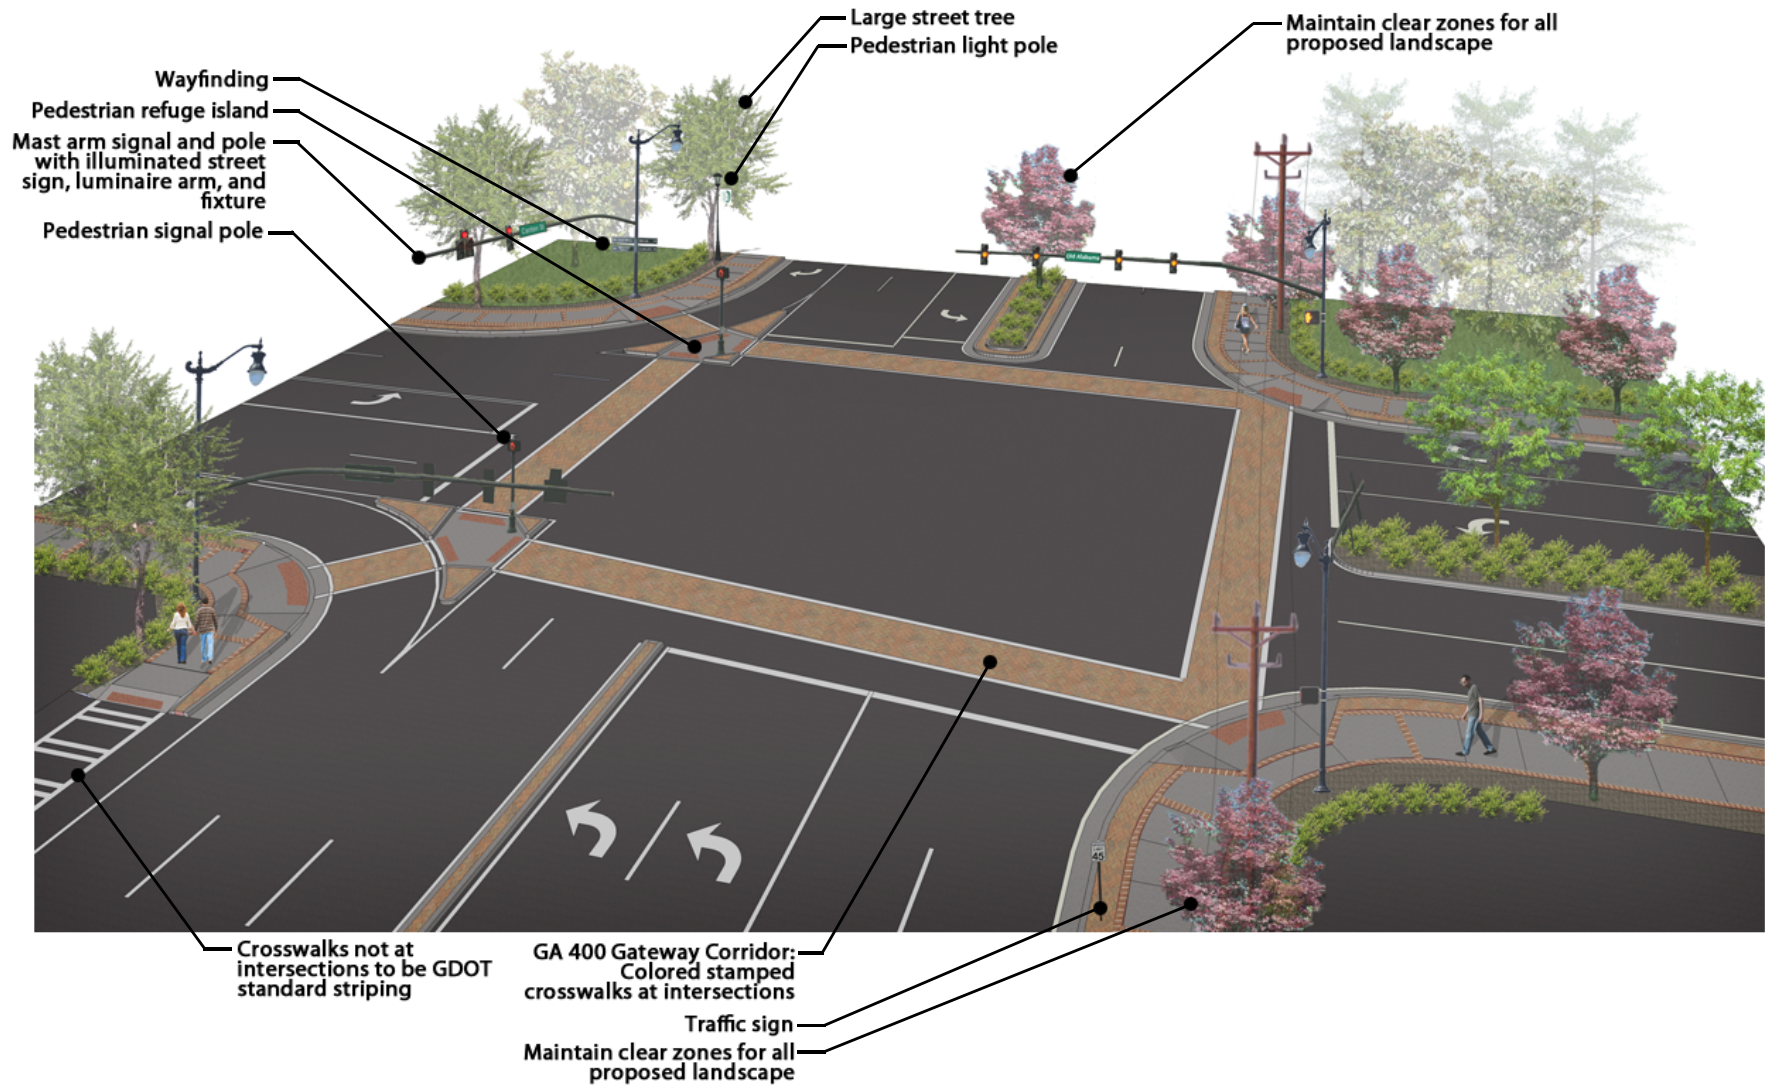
Typical Intersection: Refer to design standards for treatment of each element. Colored stamped crosswalks only required within the GA 400 Gateway Corridor intersections.
